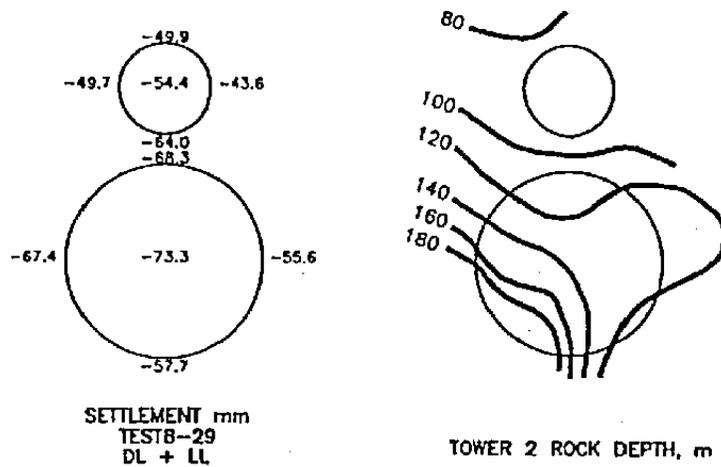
Tower 2 Settlement Map and Rock Contour Plan
